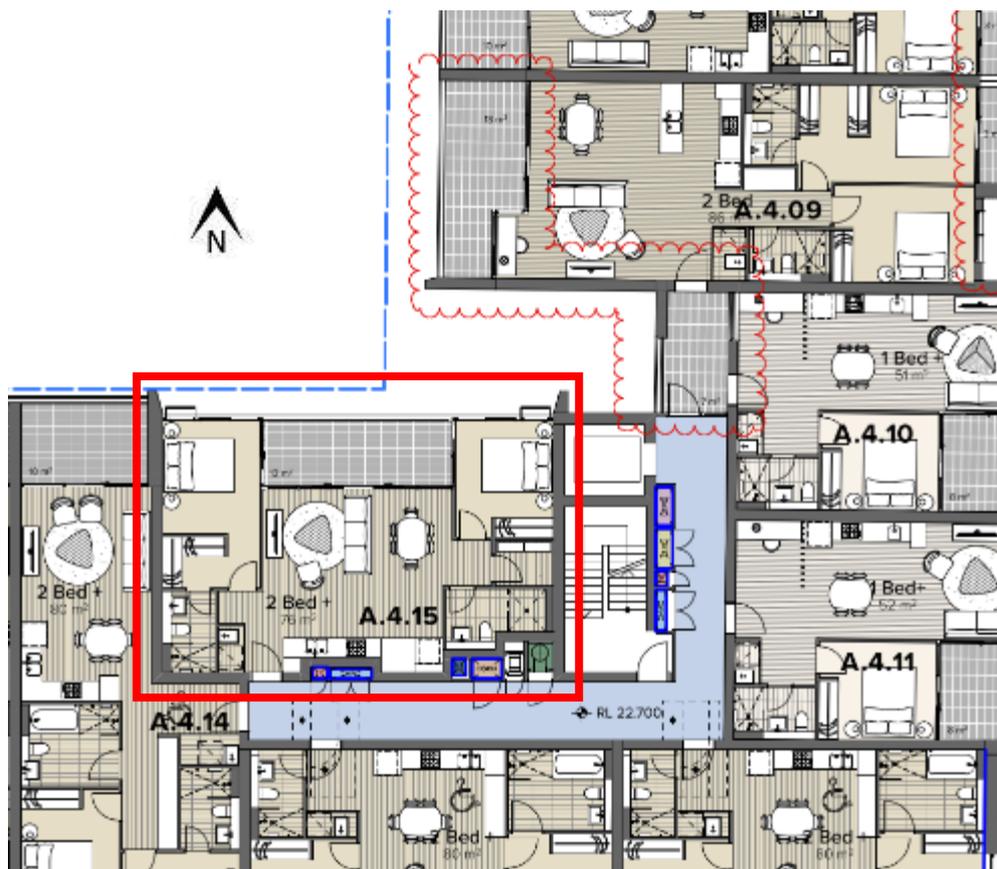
Extract from the level 4 plan, illustrating the apartment layout to be replicated on the levels below
